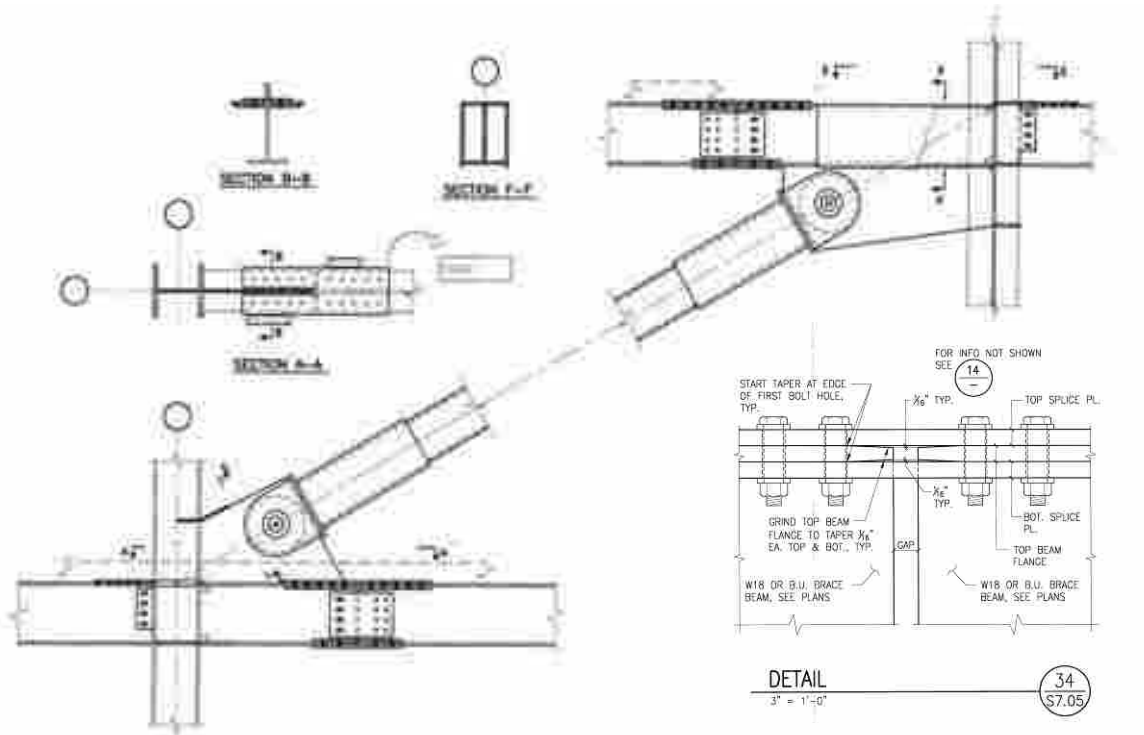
Proposed Connection Geometries and Taper Detail (8)
